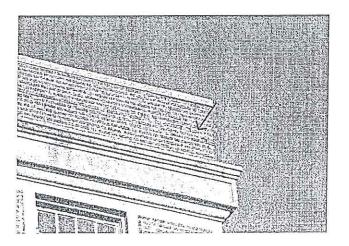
Crack in the parapet (arrow) at the north end of the parapet at the east elevation of the Nelson House Annex.
